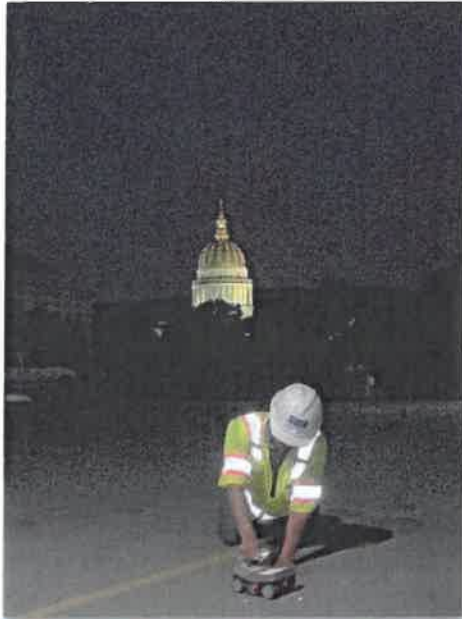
Surface Penetrating Radar of Building 13 Garage Concrete Slab
